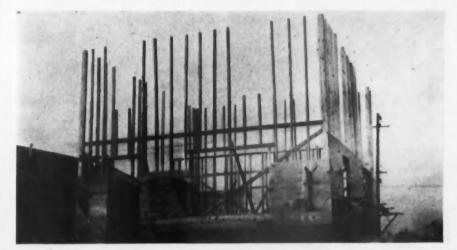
Short Sheathing and Studs Can Be Used Just as Well as Long Ones Between Windows.
